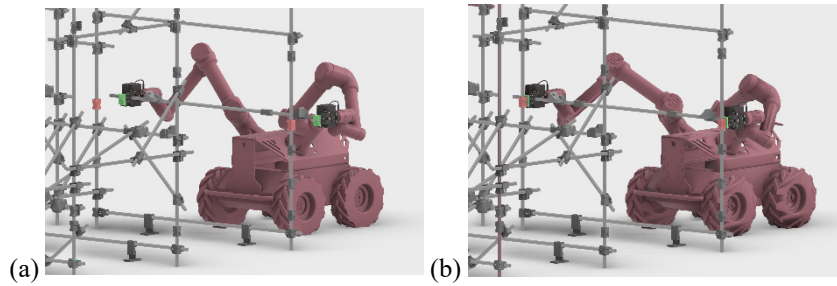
Keyframes showing a mobile robot with two GT1 end-effectors holding a horizontal tube (a) before assembly, and (b) after assembly
